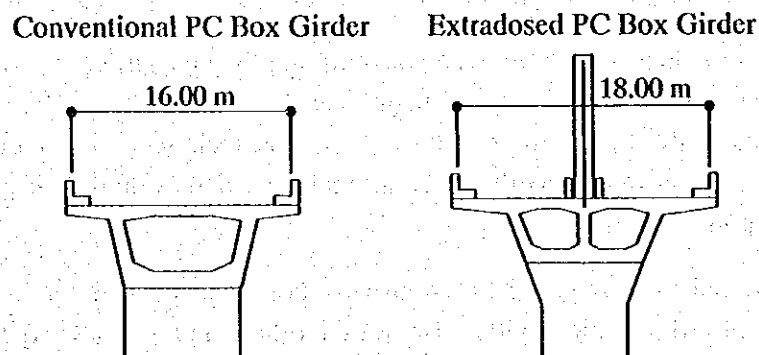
Typical Cross-sections of PC Box Girders
